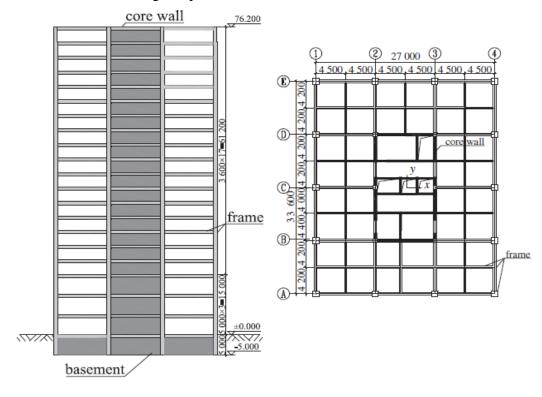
The plane layout and elevation of a 20-story tall building (Ren et al., 2017)
